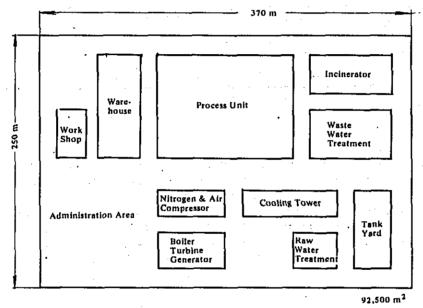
Plant Layout of 100,000 t/y p-TPA Plant
